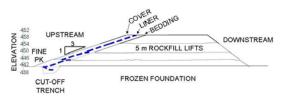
Typical PKC Facility Dam Cross Section showing the wide rockfill shell supporting upstream liner system
